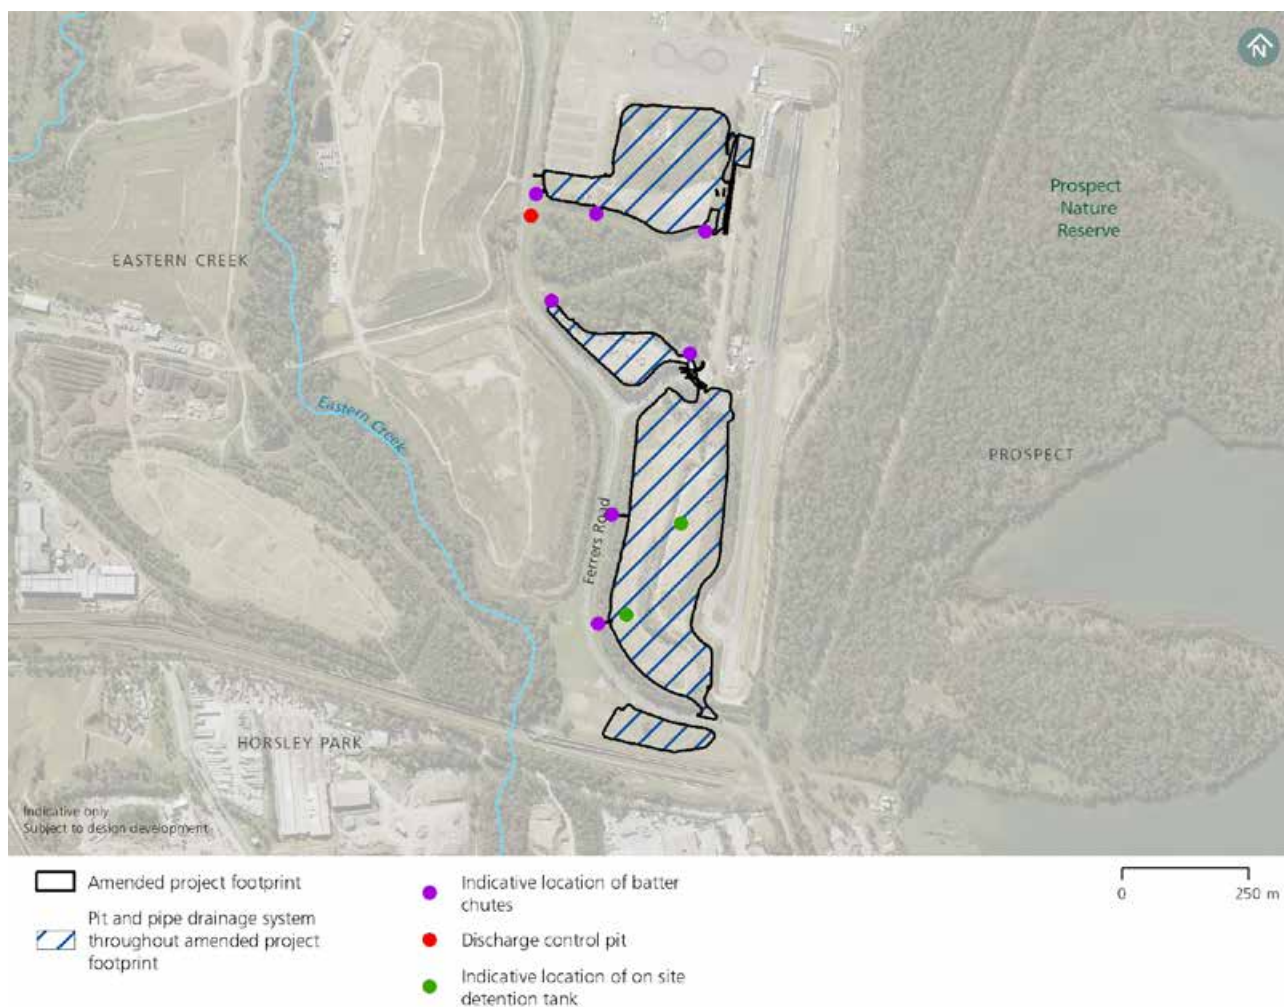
Indicative layout of the revised stormwater and drainage infrastructure
